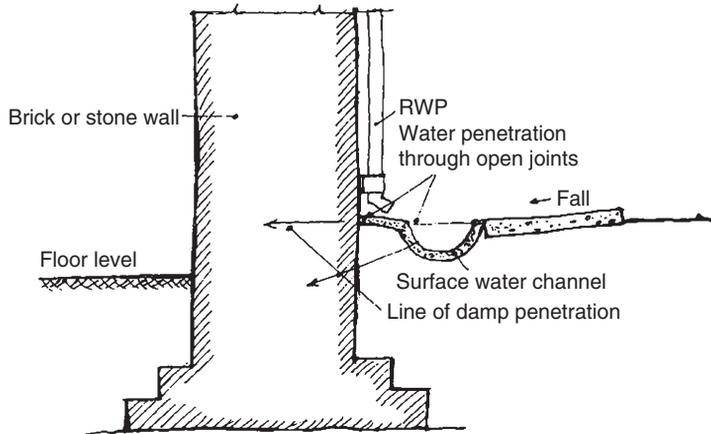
Water penetration around base of external walls where the ground floor level is below the ground level
